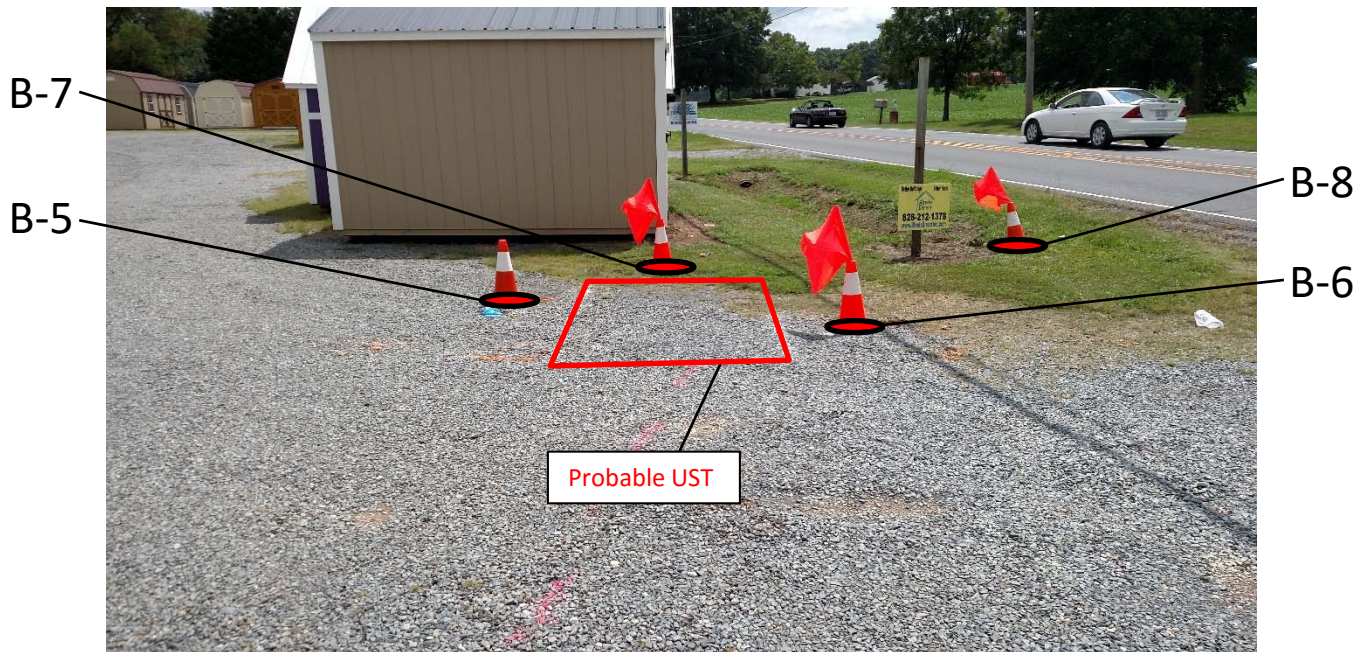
Boring locations B-5 through B-8, and a probable UST located southeast of the automotive detail shop, facing west.
